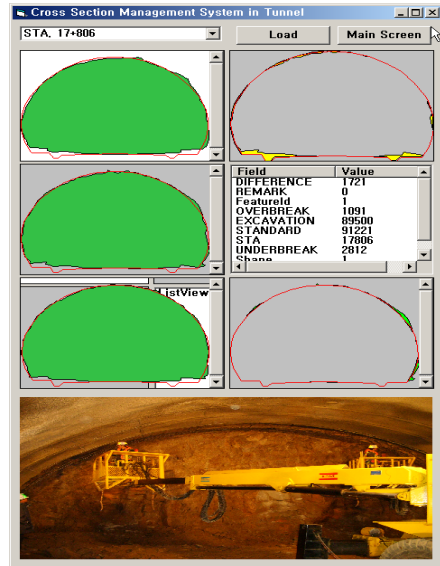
Result of excavation cross section(STA.17+805~STA.17+807)
